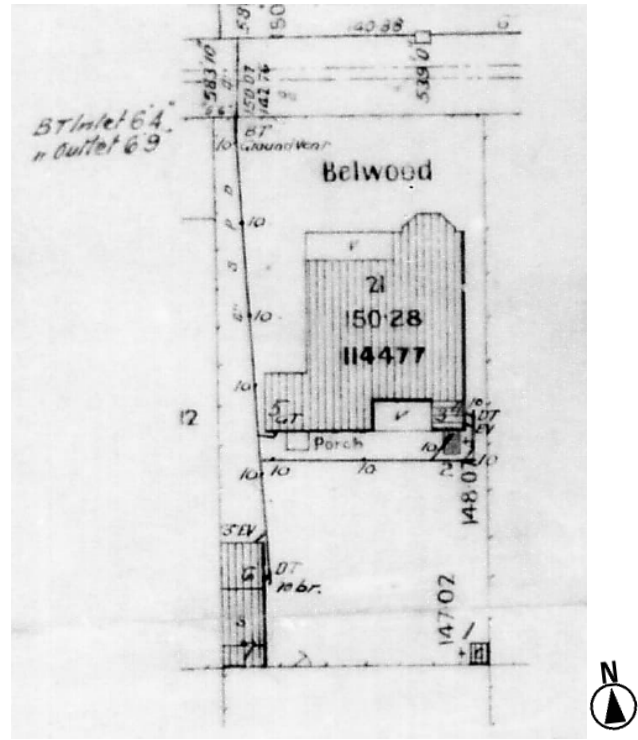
Drainage Plan of the subject site dated November 1920, showing a footprint of the house and outbuildings, annotated with sewerage works (Source: SEW, Drainage Plan No. 114477)
